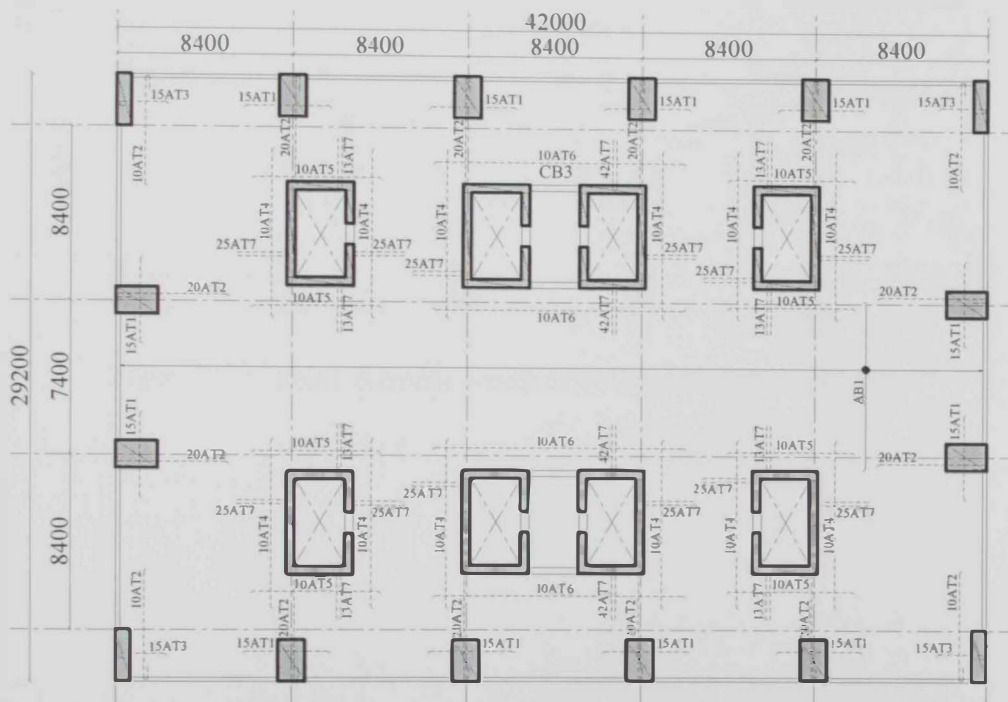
Slabs reinforcement details of B4-DIS at basement stories
